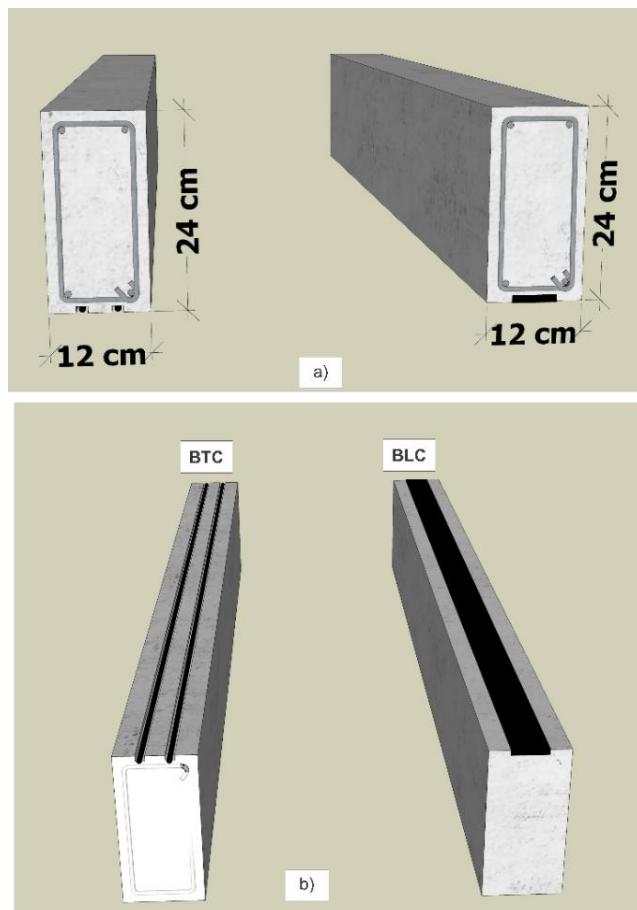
a) Beam cross-section and b) CFRP Installation Sketch
